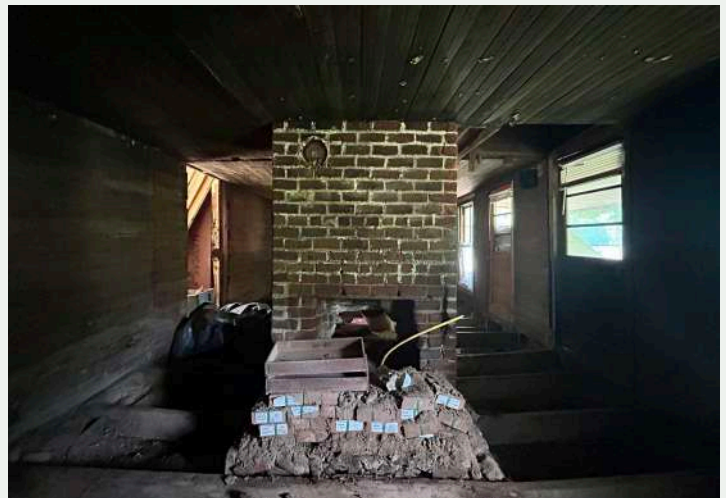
Inside the tenant house, looking west. Note the hole in the ceiling to the left of the chimney, which once held the stairs.
